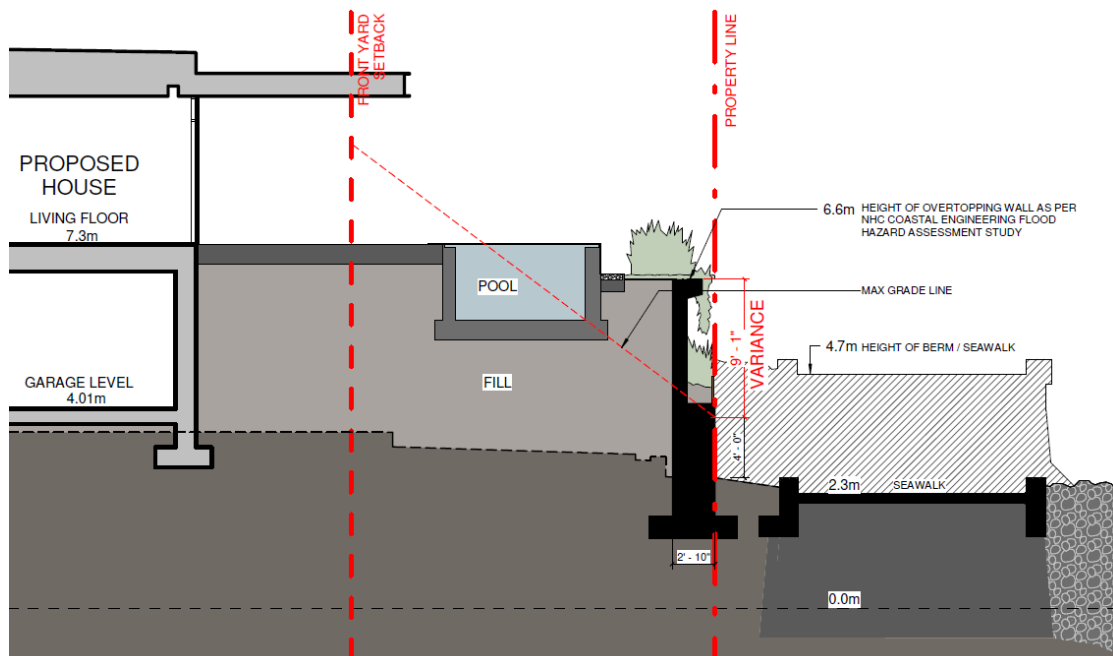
Section showing proposed retaining wall to the south of the site adjacent to the Centennial Seawalk.
